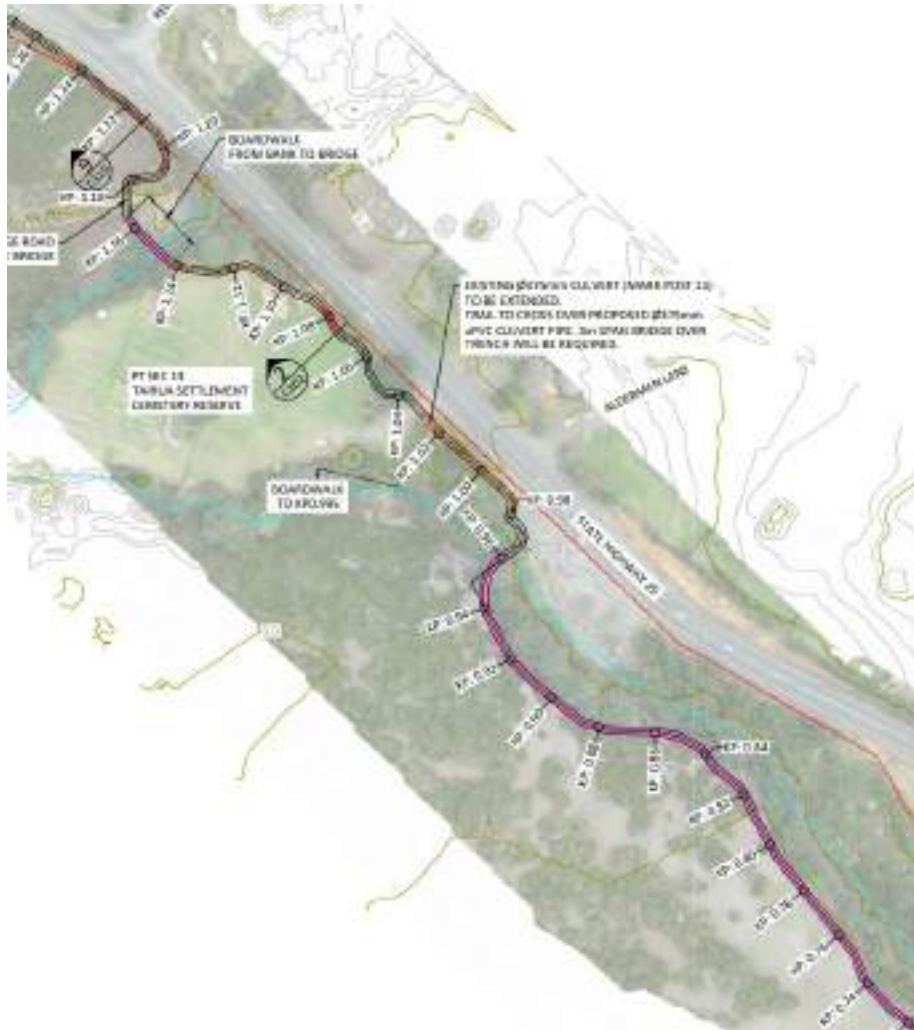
Trail set out from KP: 074 to KP: 1.24. Boardwalk shown in pink.
